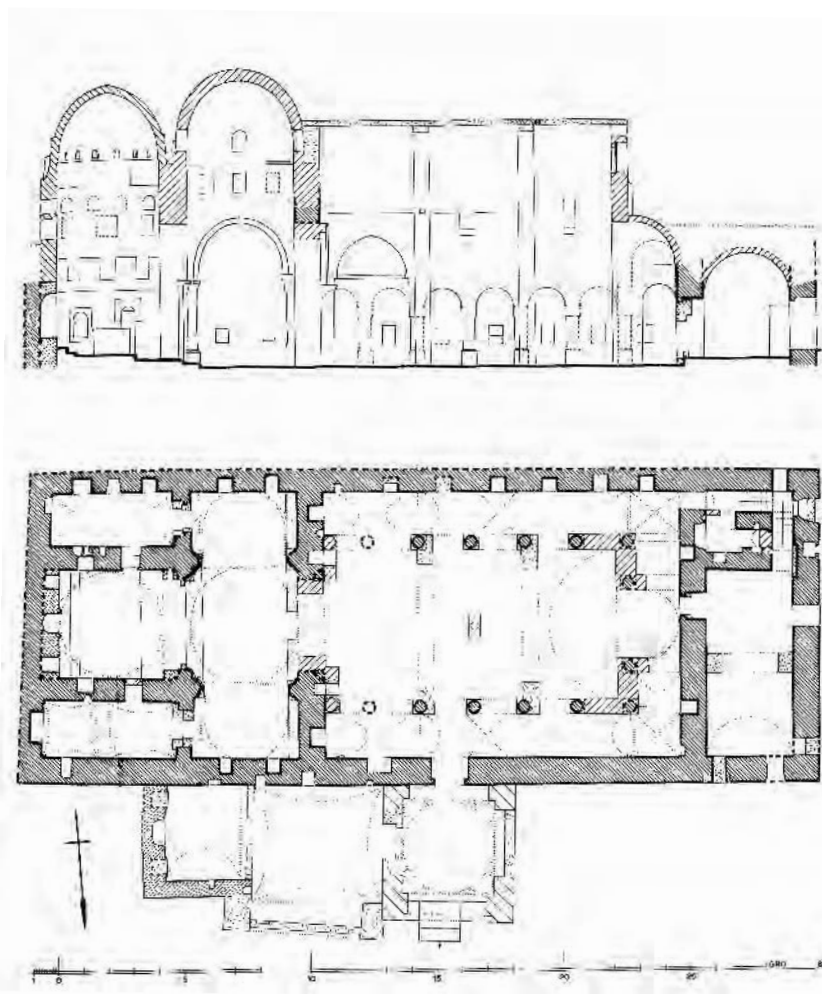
Church of al-'Adhrā', Dayr al-Sūryān: plan and cross-section. (Plan: after Grossmann)
